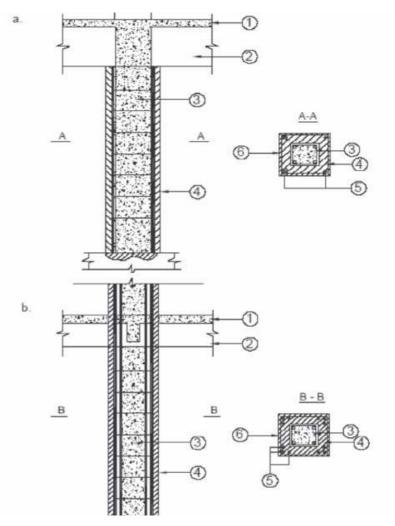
Repair of concrete column by (a) local and (b) Global jacketing (1. Slab: 2 Beam;3. Existing column; 4. Jacket; 5. Added longitudinal reinforcement; 6. Added ties)
